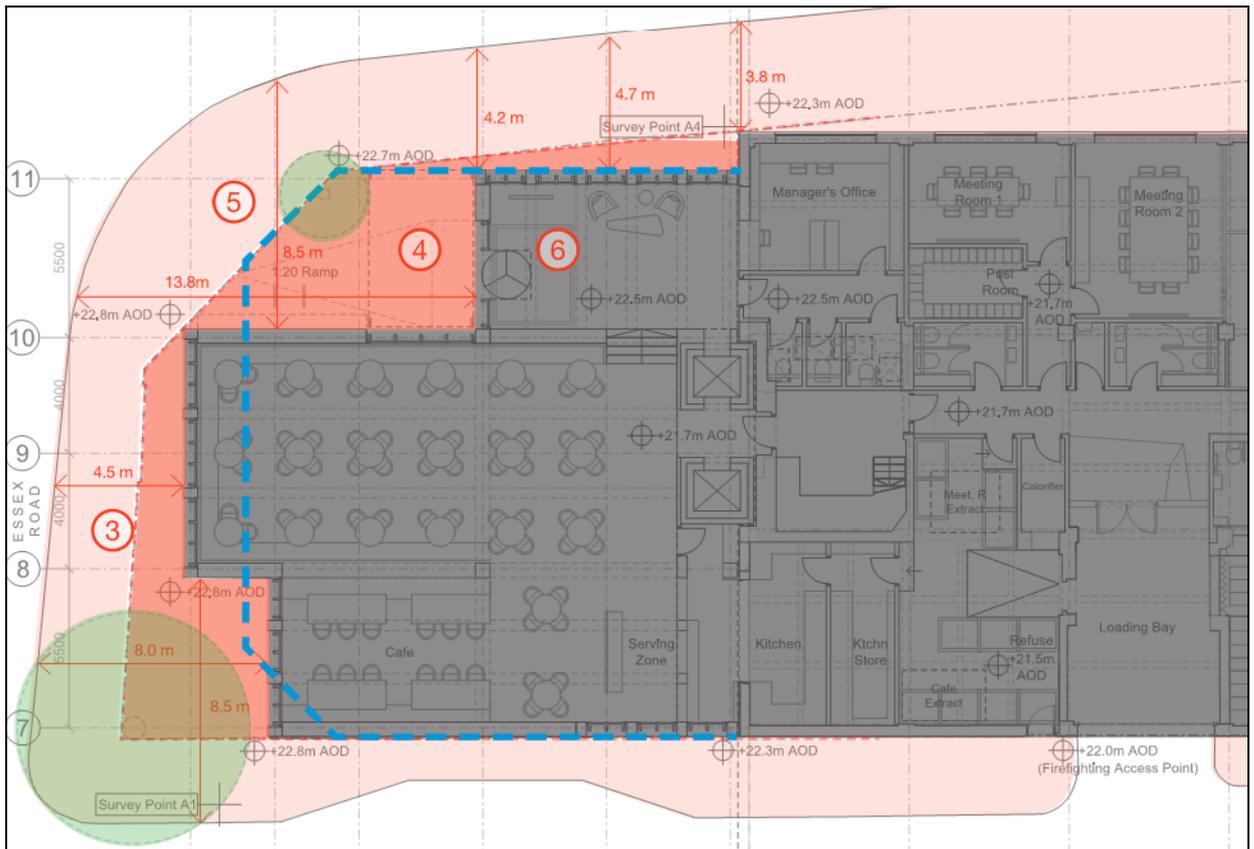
Public realm at west end of site – light pink denotes existing pavements, dark pink denotes land within the application site to be added to the public realm, grey indicates the proposed building footprint, and blue dashed line indicates the footprint of the previous (refused) proposal.
